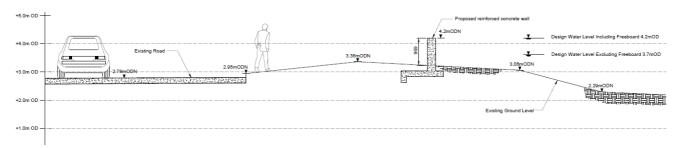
Typical Cross Section of Concrete Retaining Structure
